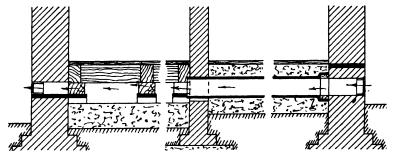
Air duct through concrete floor to allow for ventilation of hollow floor.
